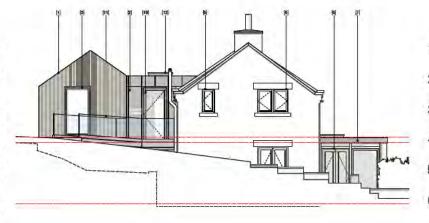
Extract from PL_003 Proposed Elevations and Sections: Sheet 2 showing the south-west elevation.
